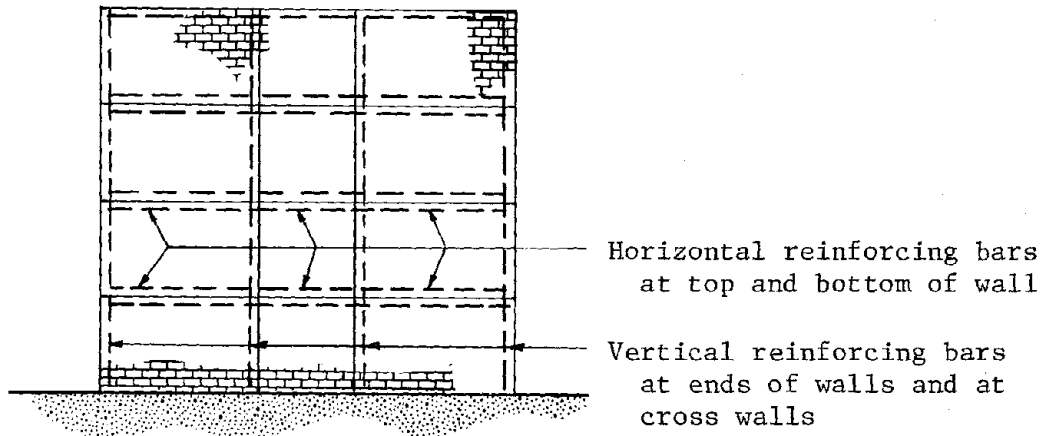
Minimum steel reinforcement layout to prevent sudden failure and progressive collapse.
